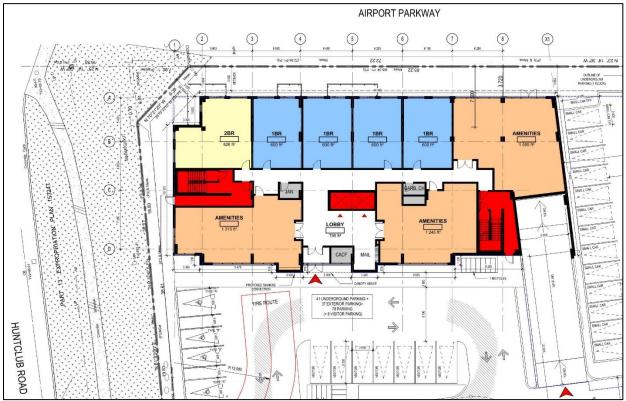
Excerpt from Site Plan prepared by NEUF Architects, Drawing D, dated April 1, 2020.
